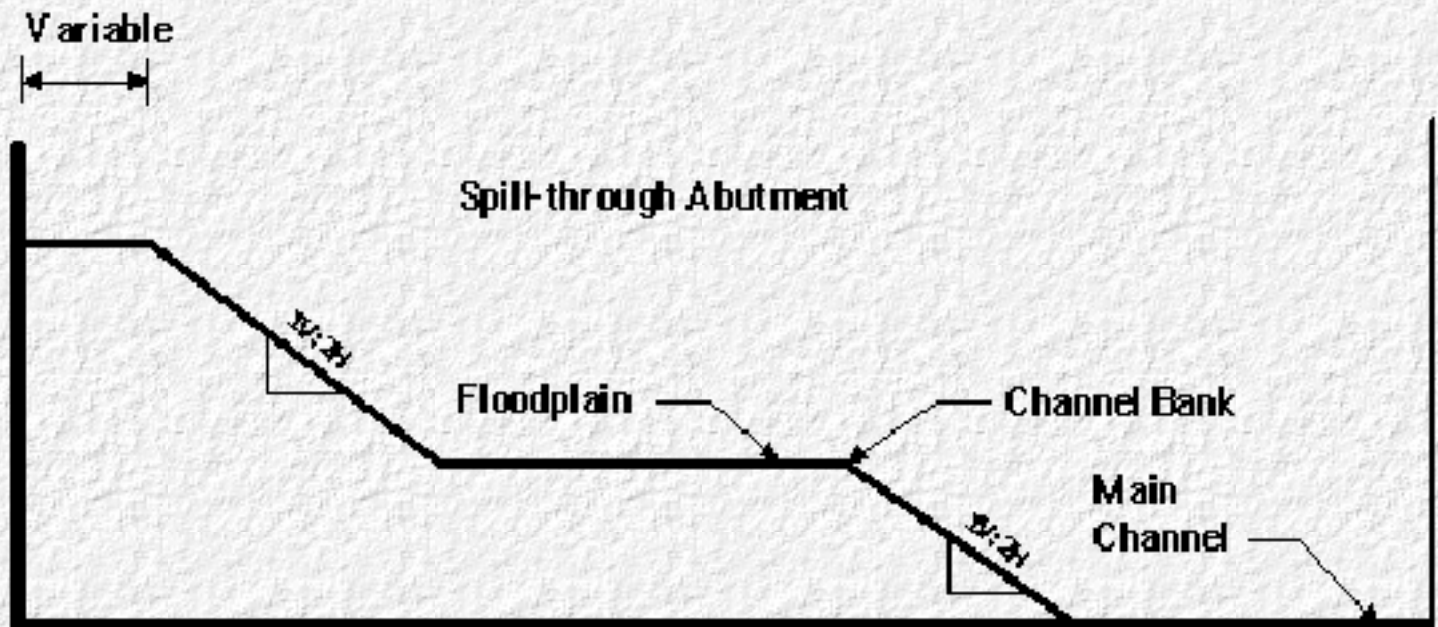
Section View of a Typical Setup of Spill-Through Abutment on a Floodplain with Adjacent Main Channel
